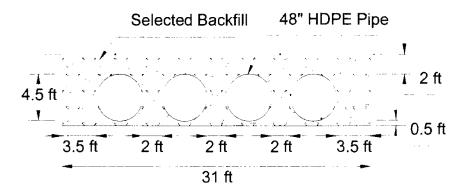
Cross Section of the Trench in Wichita Falls.
